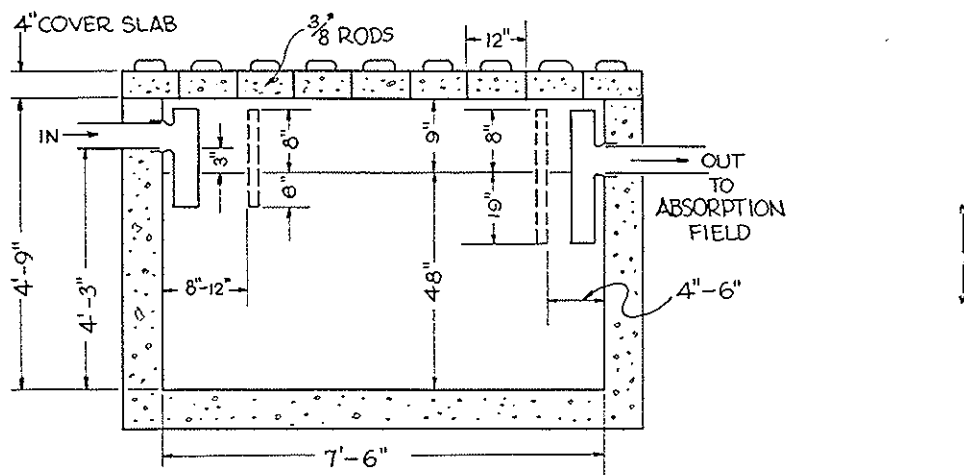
Typical section through a 750-gallon septic tank having a three-foot six-inch inside width. Cast-in-place concrete tanks have walls and floors six inches thick.
